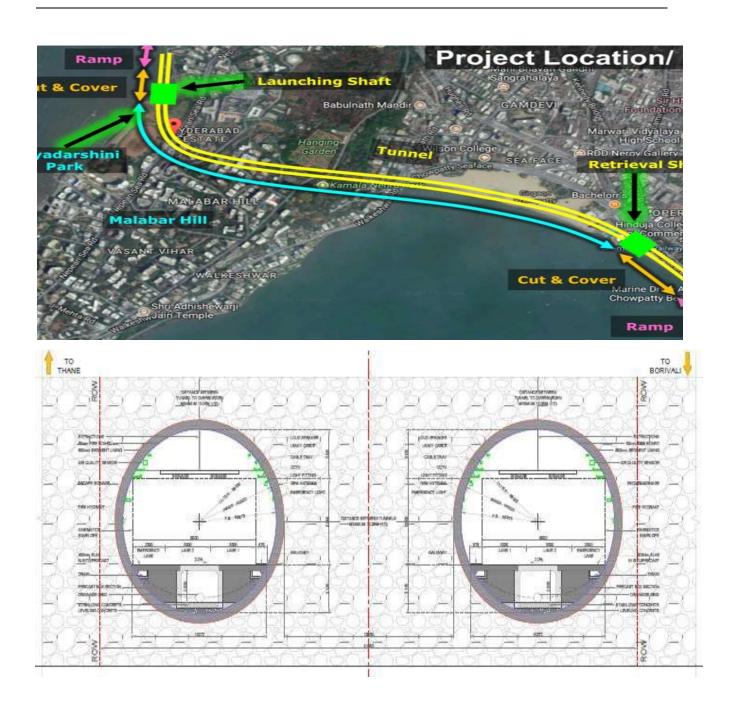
The Mumbai Coastal Road project's alignment and tunnel details.
